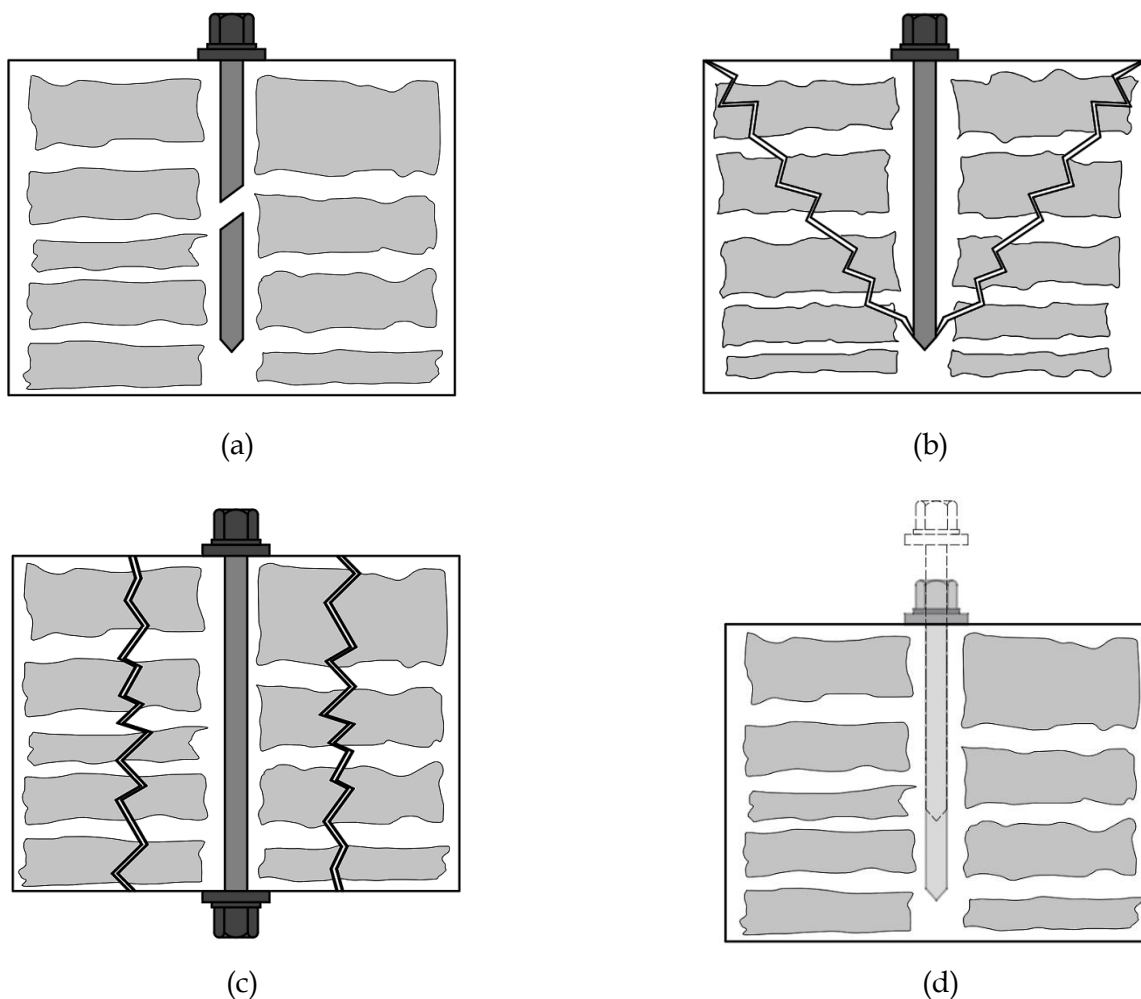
Anchors main failure modes: (a) steel anchor failure, (b) and (c) substrate masonry failure and (d) pull-out failure.
